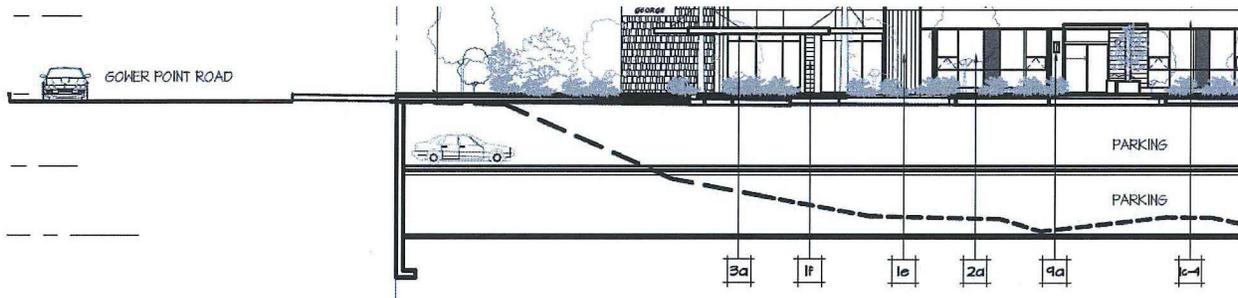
2014 initial design: two layers of parking below Gower Point Road (drawing 4.0.3.)
